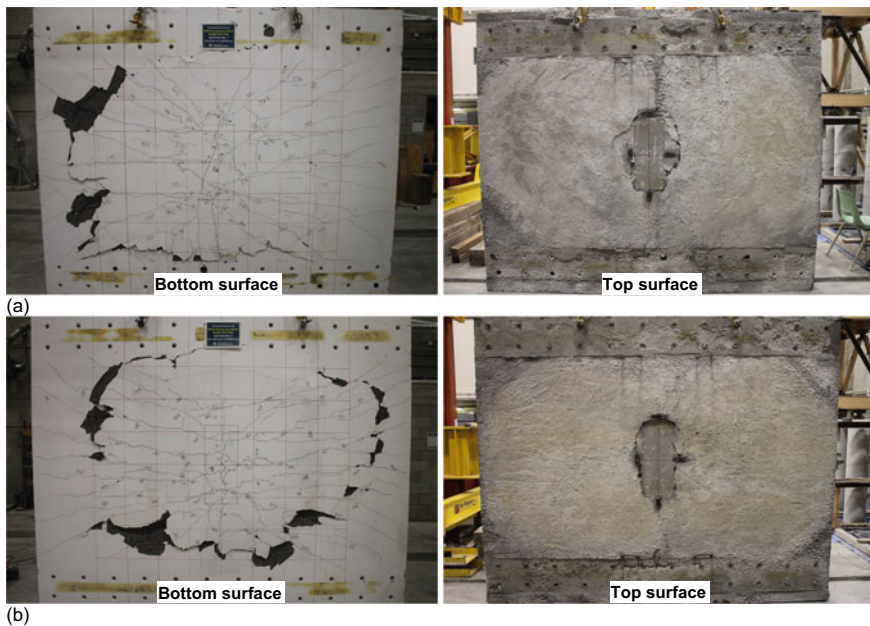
Top and bottom surfaces of specimens after testing: (a) G; (b) S
